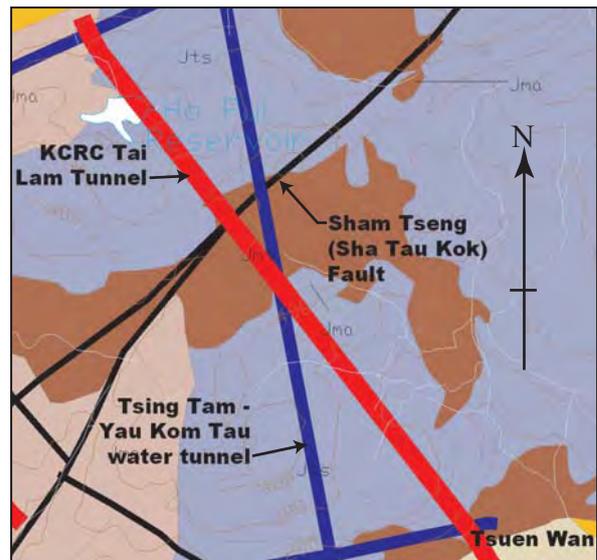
DB350 Tai Lam Tunnel location plan
